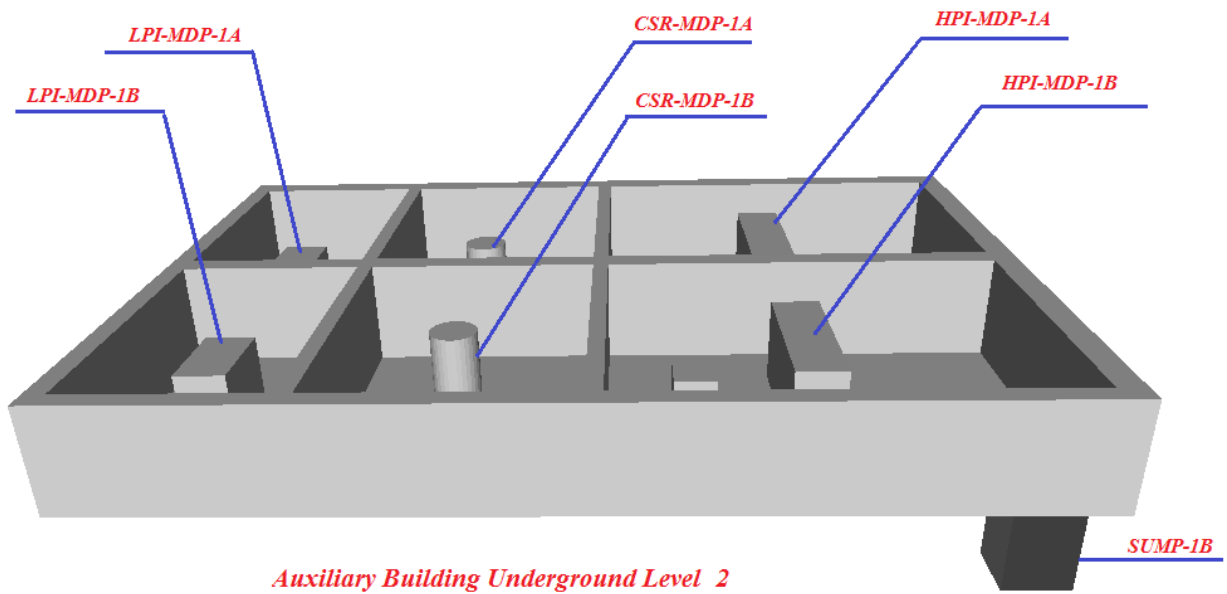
3-D model of the Auxiliary Building Underground Level 2.
